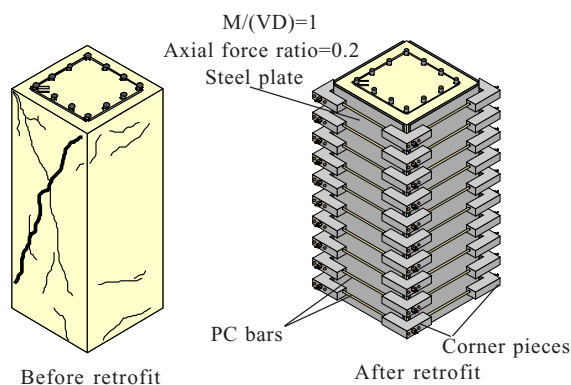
Emergency retrofit for extreme short RC columns by PC bars and steel plates
